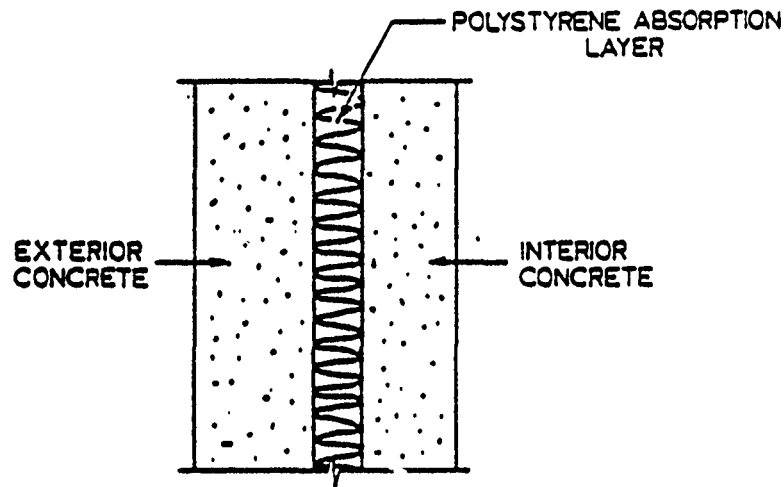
Cross Section of the Concrete-Polystyrene-Concrete (CPC) Layered System.
